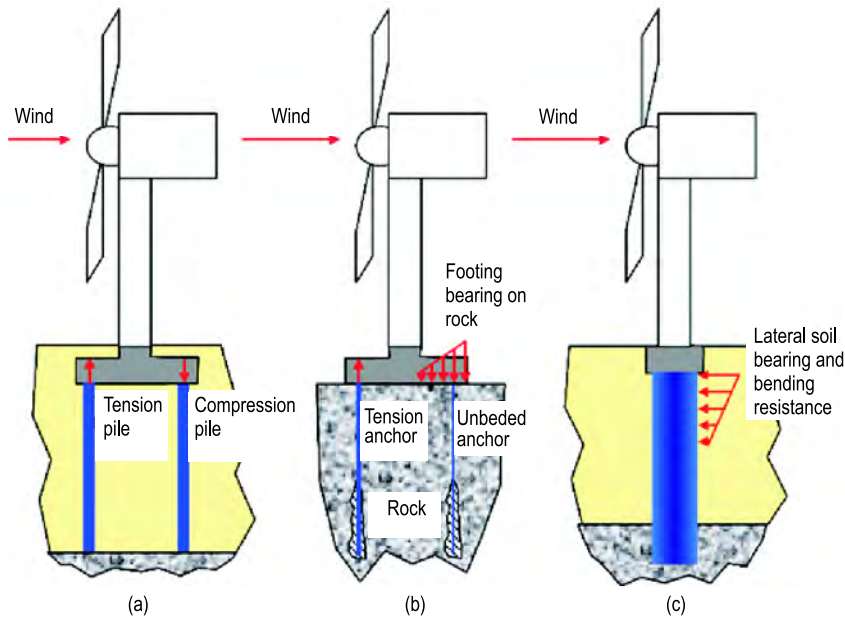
Three Deep Foundation Systems: (a) Pile group, (b) Anchored footing, (c) Single pipe. Courtesy: www.altenergymag.com
